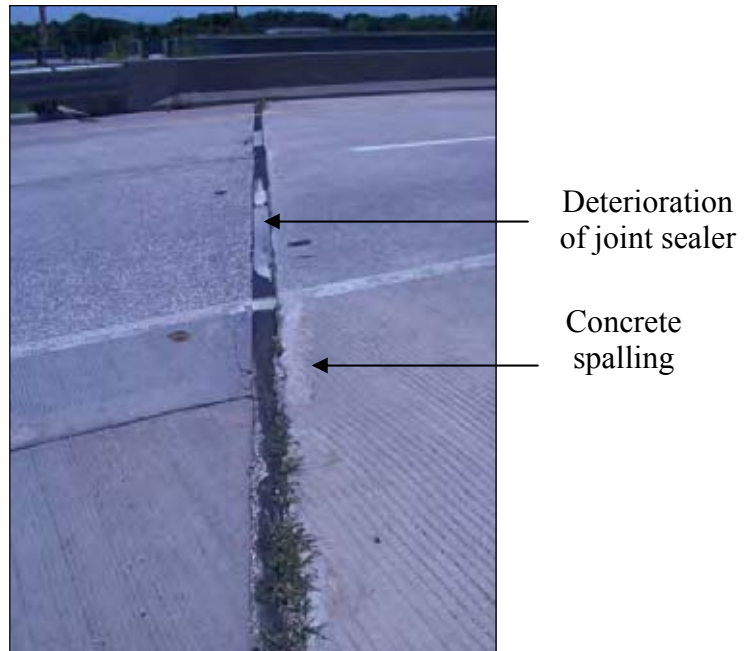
Deteriorated flexible foam used as joint filler (South end of NBL)
